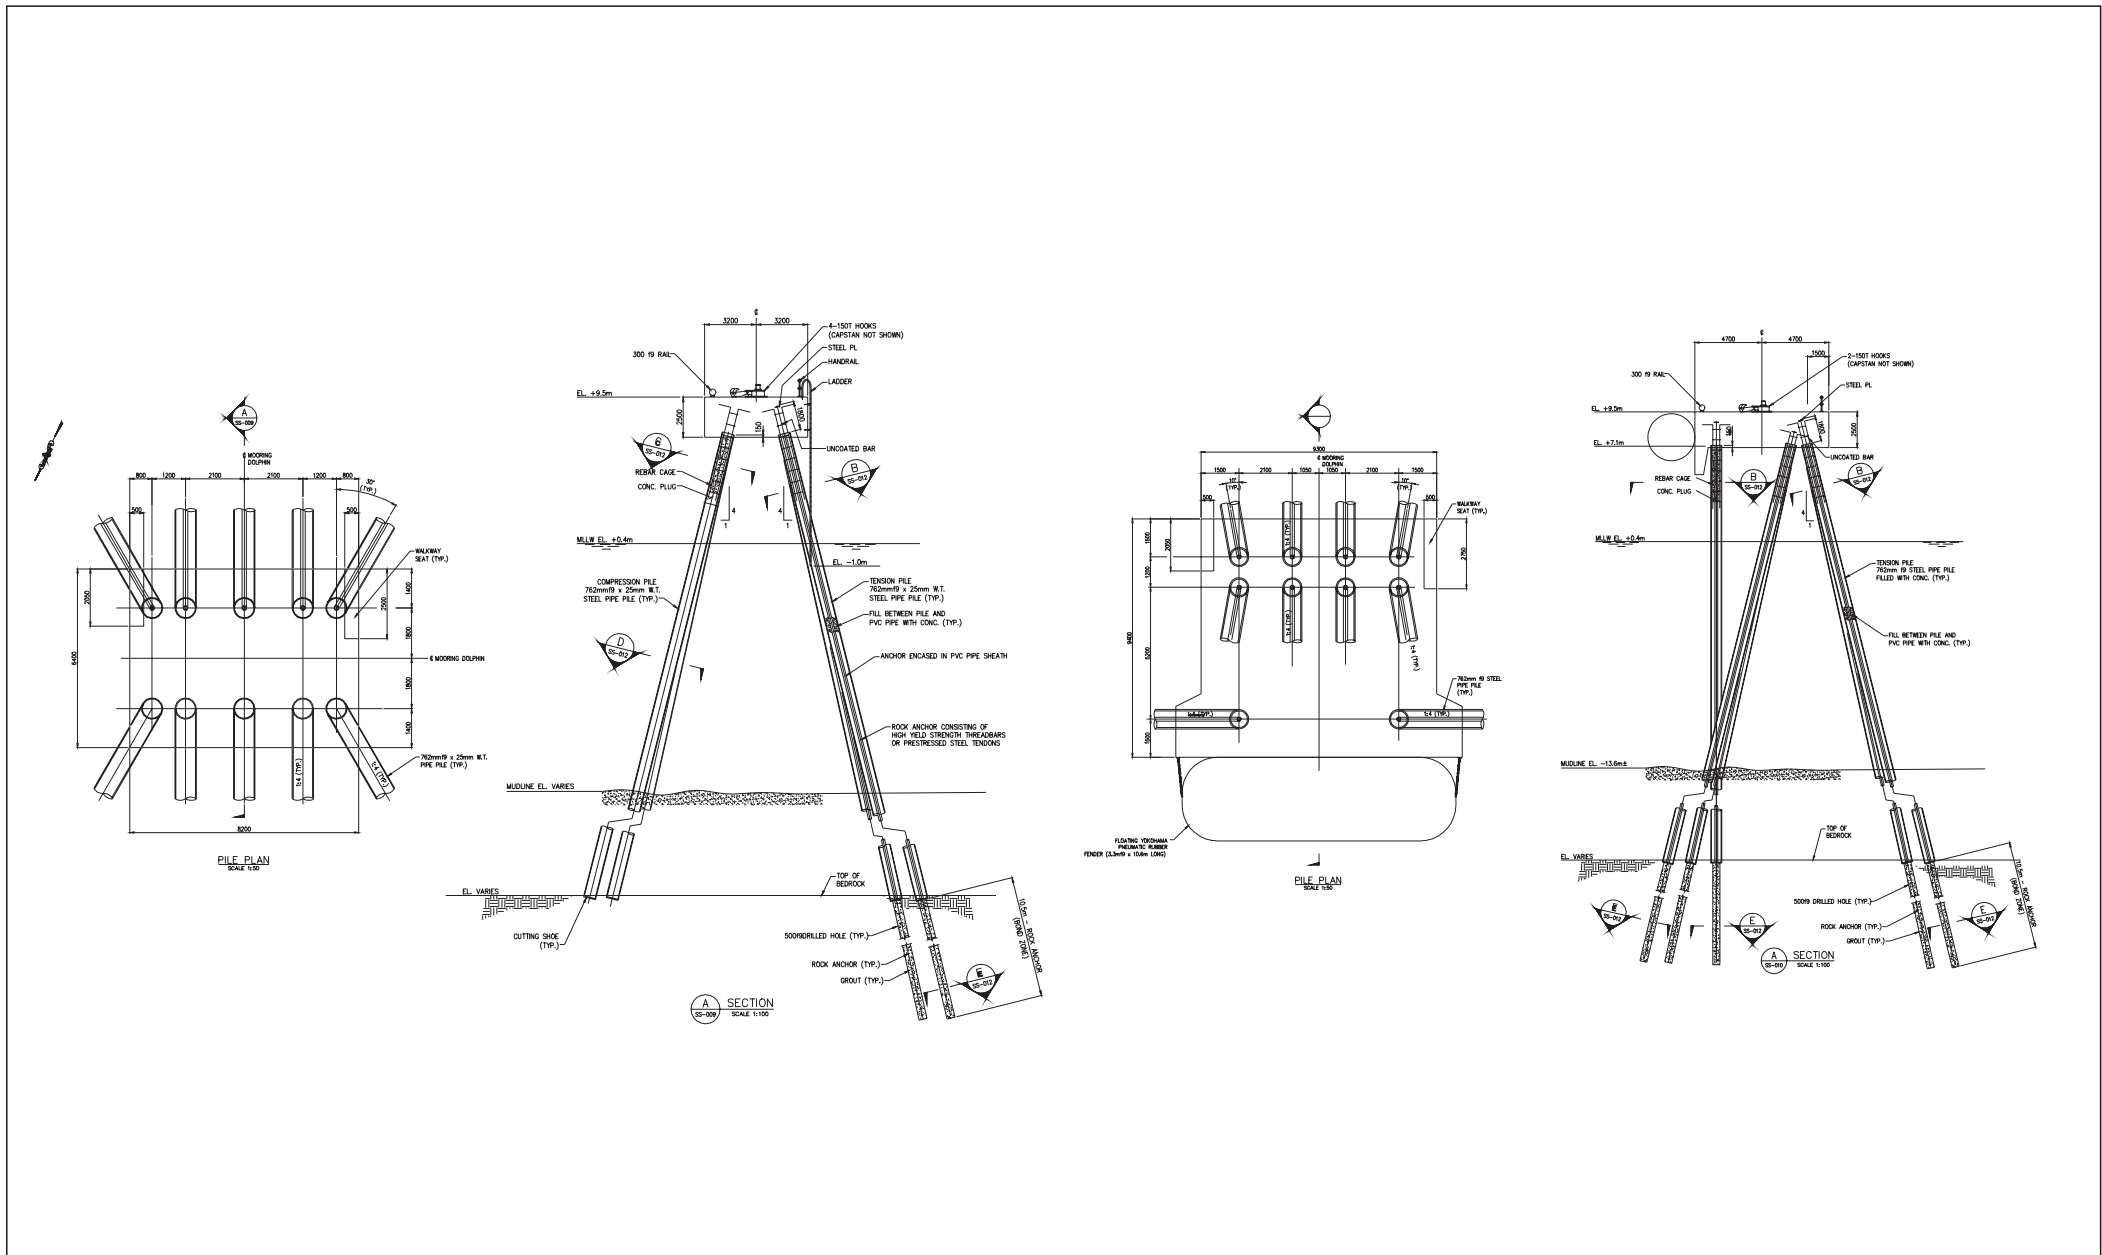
Conceptual Plan of the Mooring Breasting Dolphin for the LNG Jetty at South Soko Terminal
